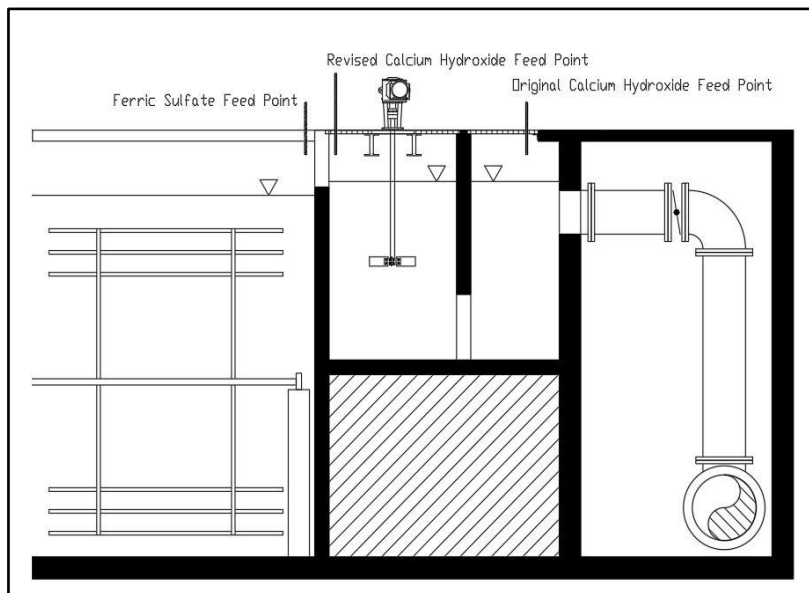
Elevation View of the Plant's Rapid Mixers
